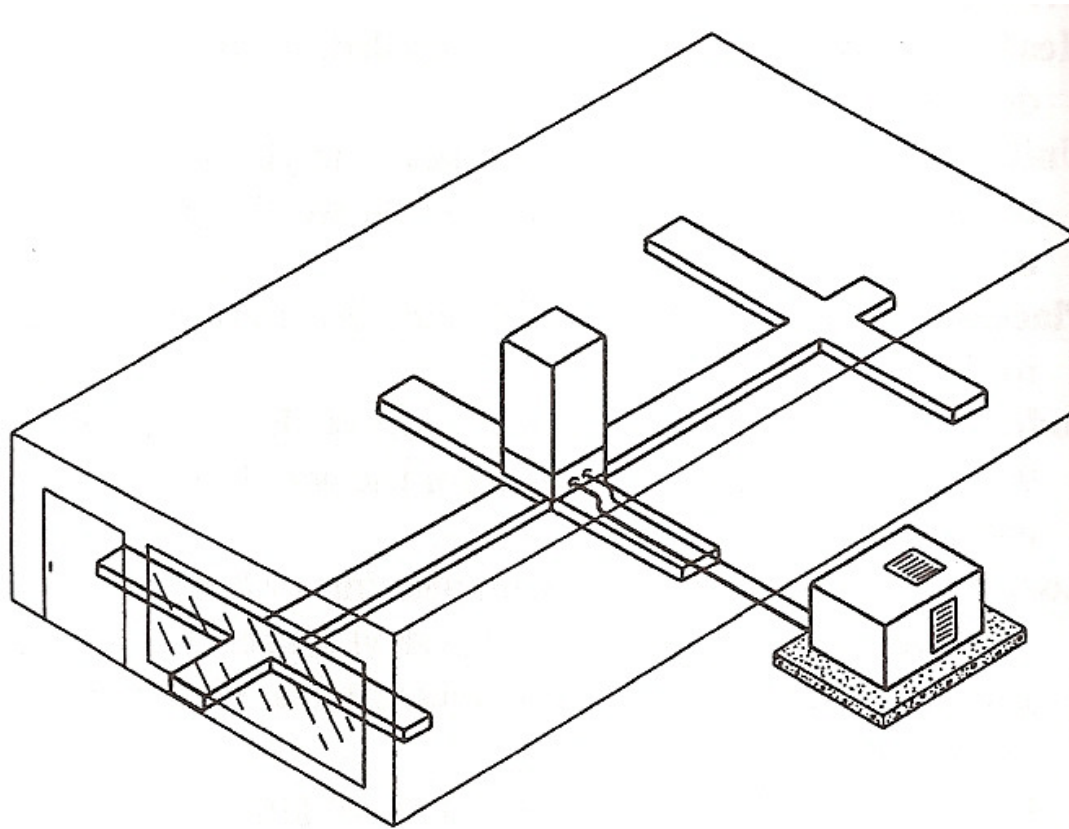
Outdoor Installation of Split-System Air-Cooled Condensing Unit with Indoor Coil and Downflow Furnace
